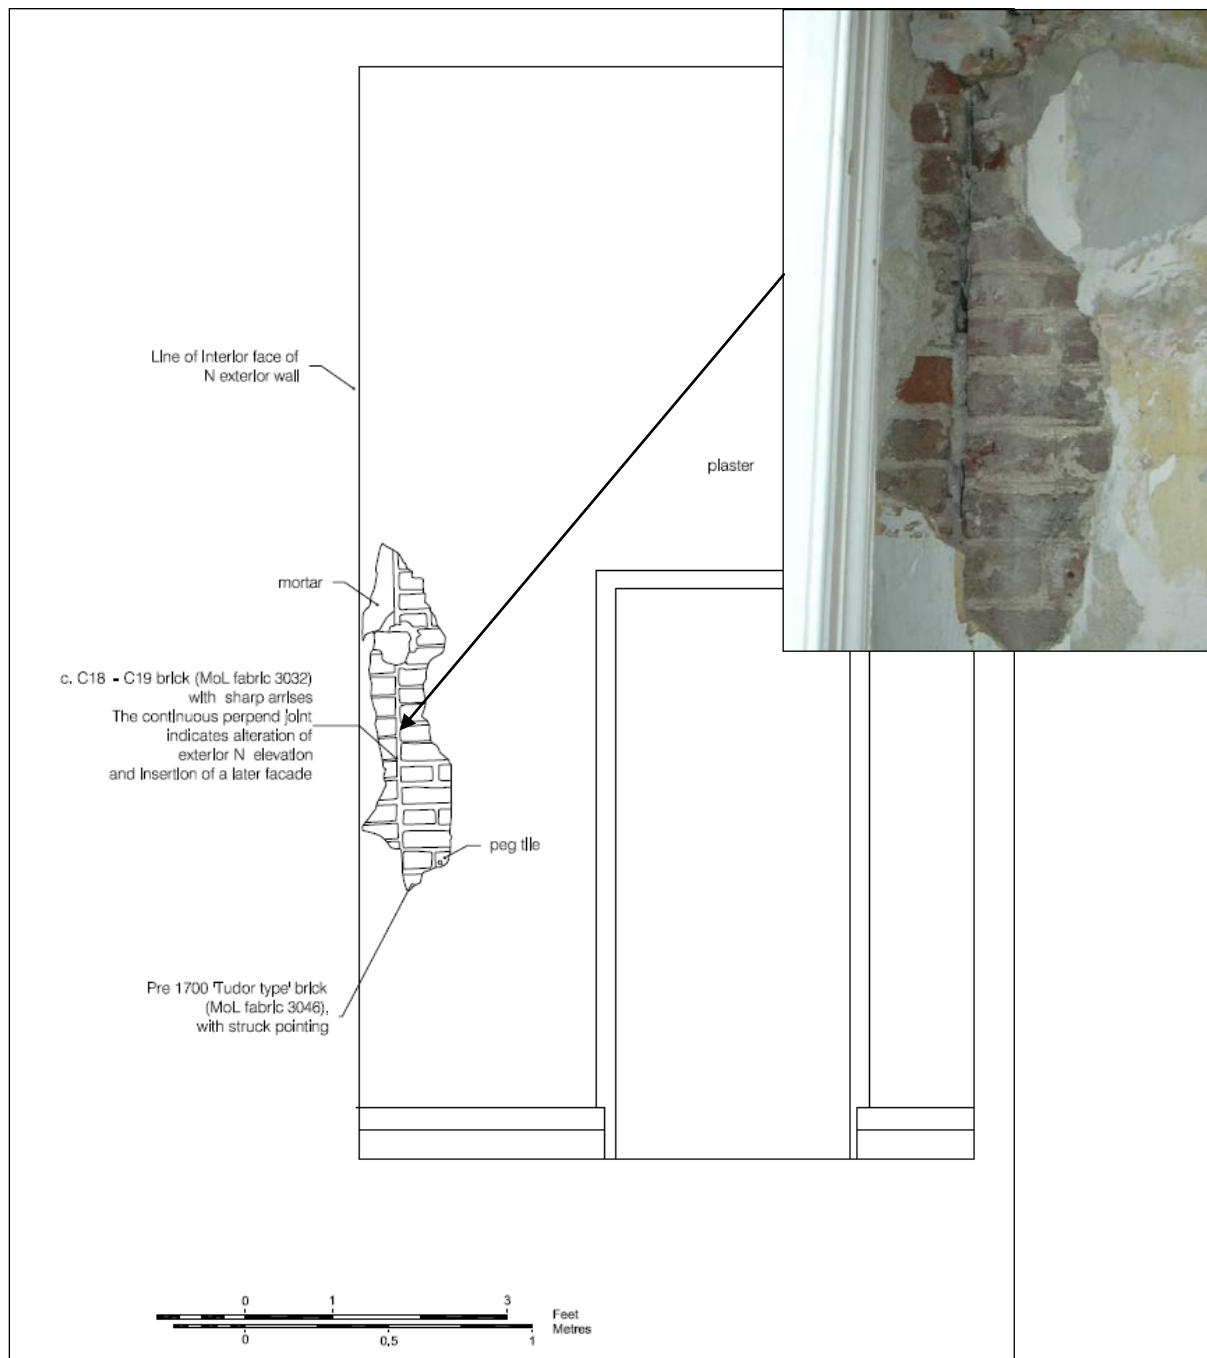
Detail of originally external wall (pre 1764) with struck pointing, and later North Elevation (Room 116 ↑E)
